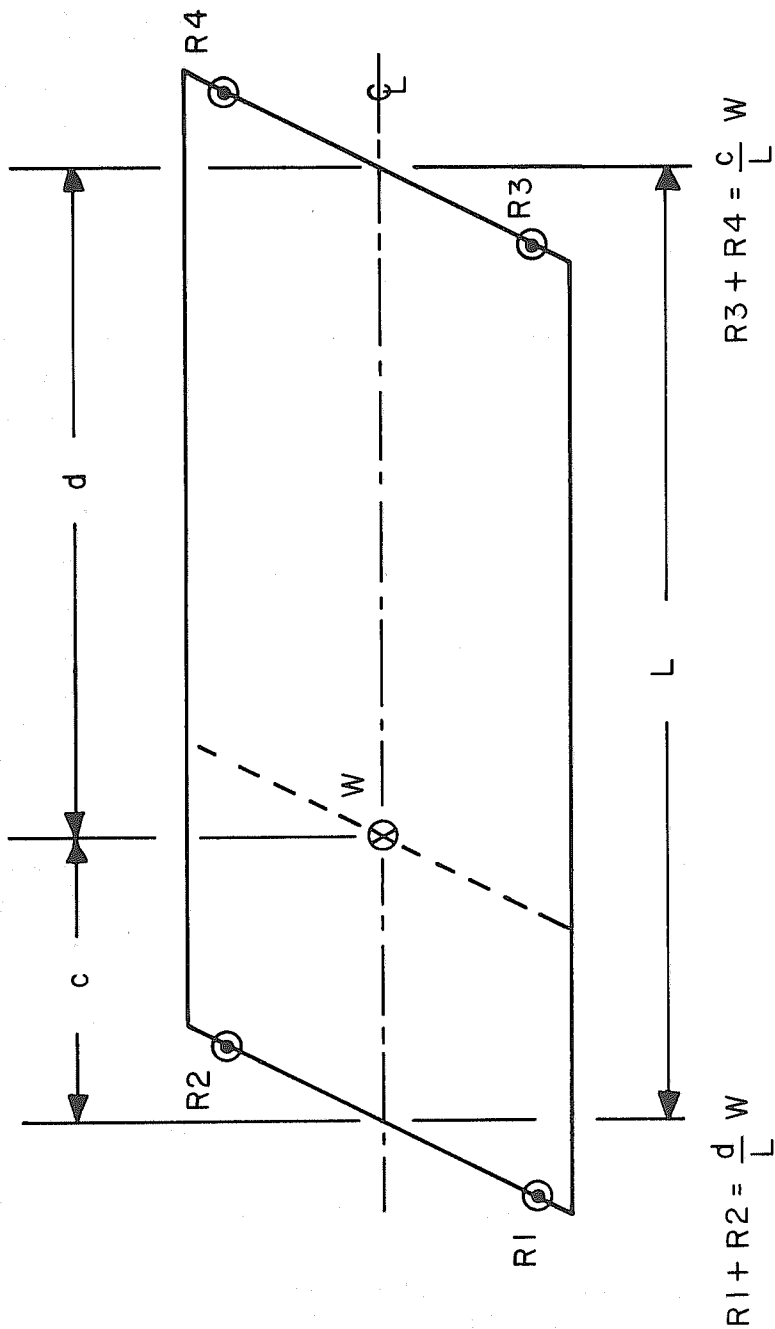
POINT LOAD ON LONGITUDINAL CENTERLINE OF BRIDGE
